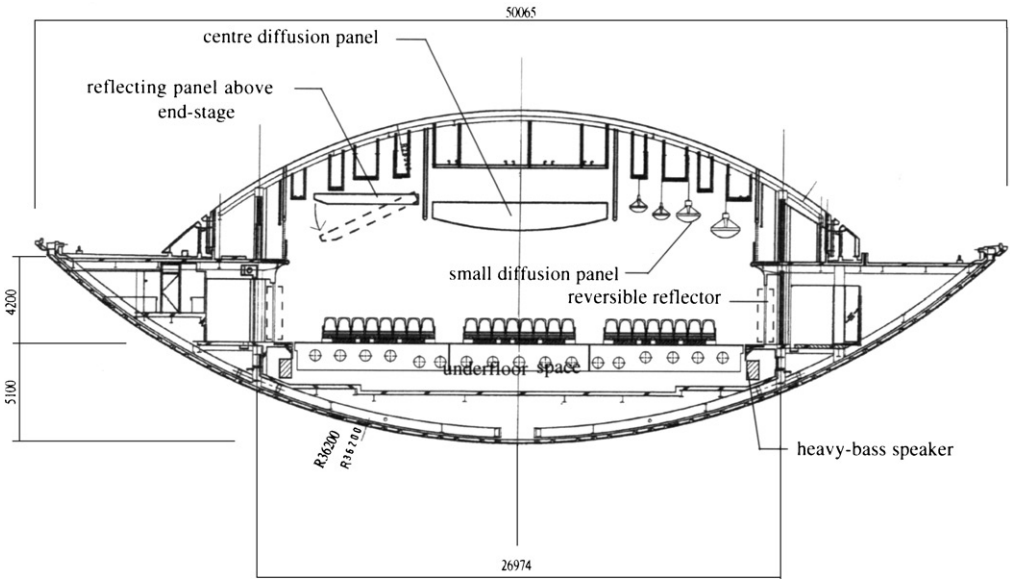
Cross-section of Orbis Hall with various acoustic equipments. Volume of the under-floor space is 990 m^3 . Material of the floor and wall in the under-floor space is exposed concrete.
